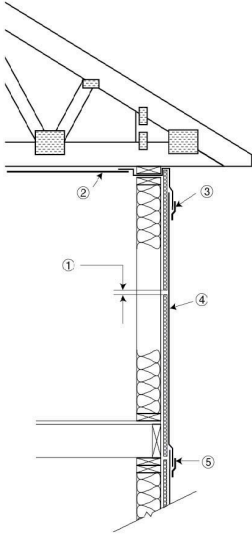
Exterior wall cross-section of the product – top wall/ceiling continuity
